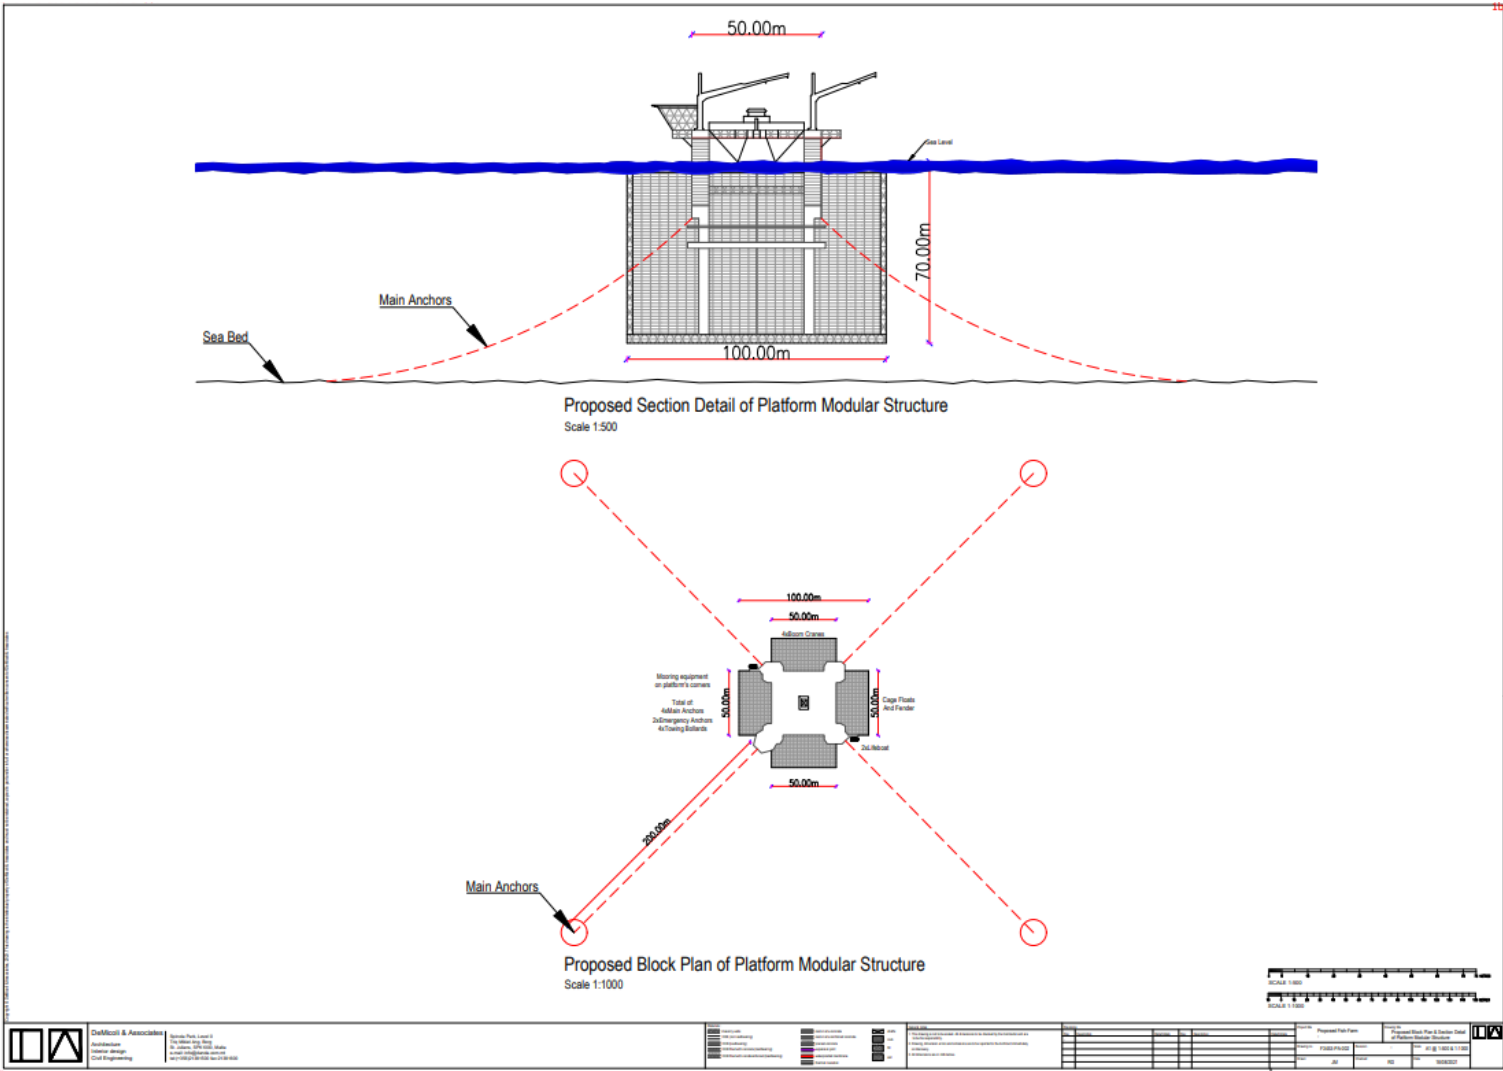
BLOCK PLAN AND SECTION DETAIL OF PLATFORM MODULAR STRUCTURE
